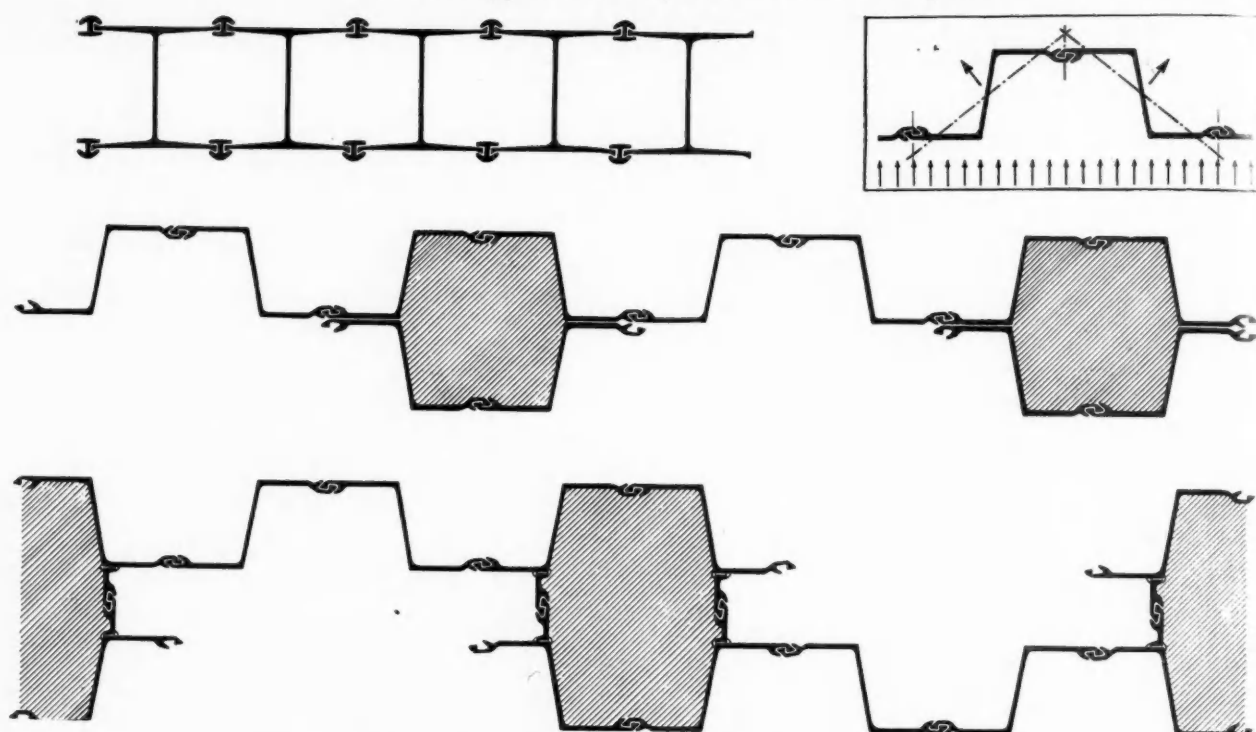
(top right in box). Deflection of the single elements in a "Z" piling wall.
